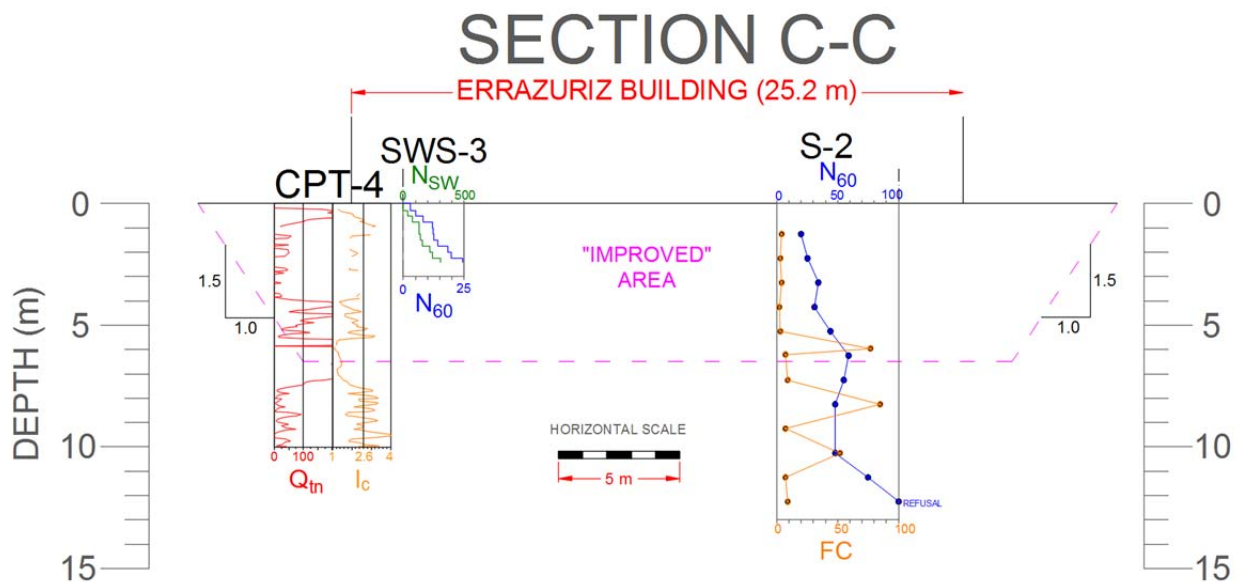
Section C-C through west side of Errazuriz and Montt Buildings.
